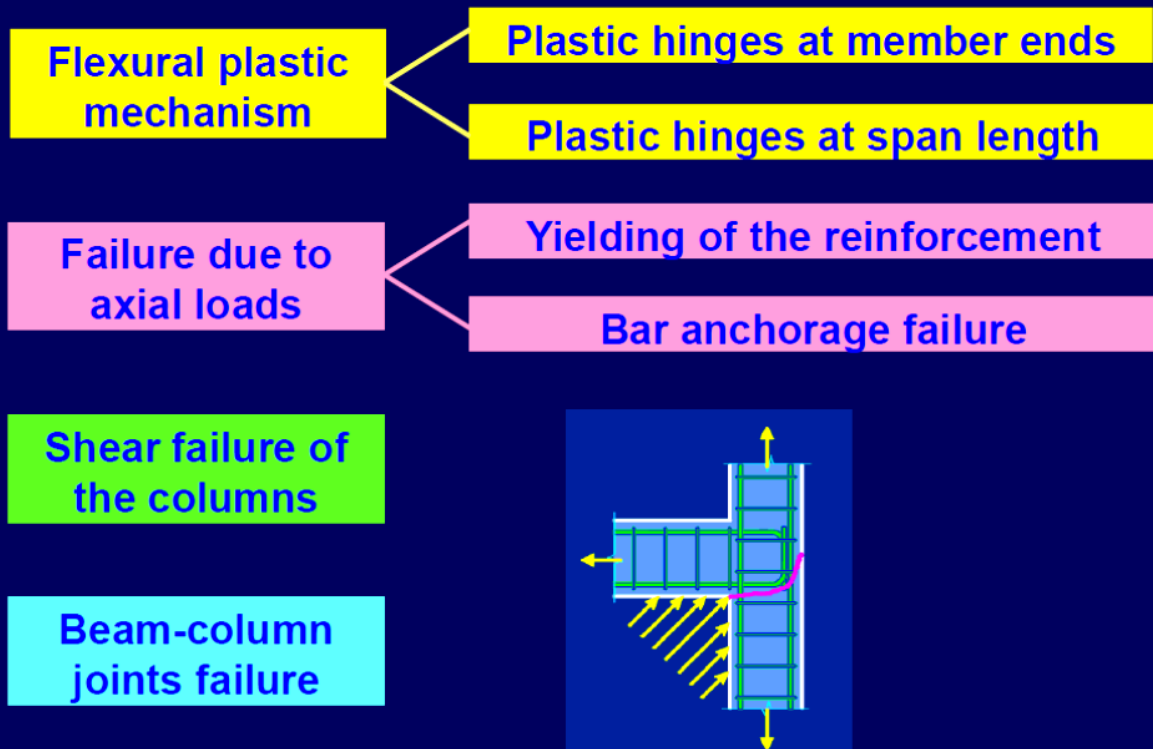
; Infilled frame failure modes (Benson, P Shing and Armin, B Mehrbi (2002))
